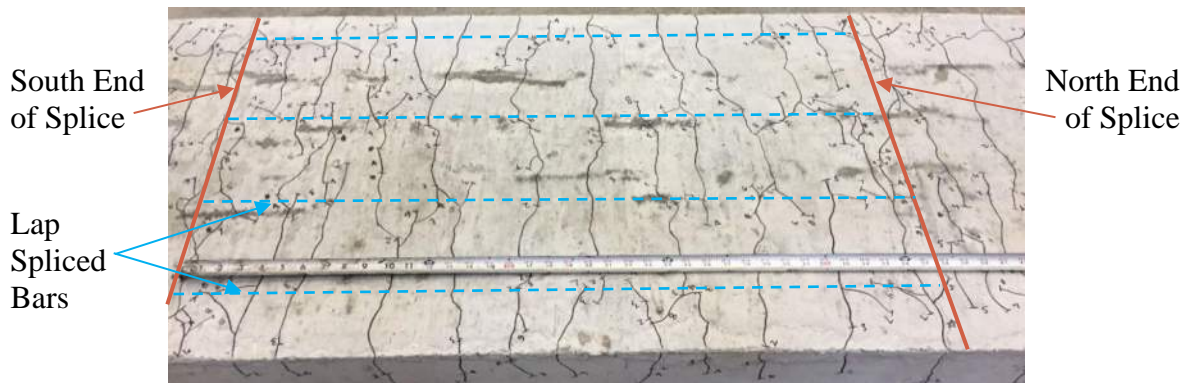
Post-Failure Shear Span Cracking (S-60-5)
